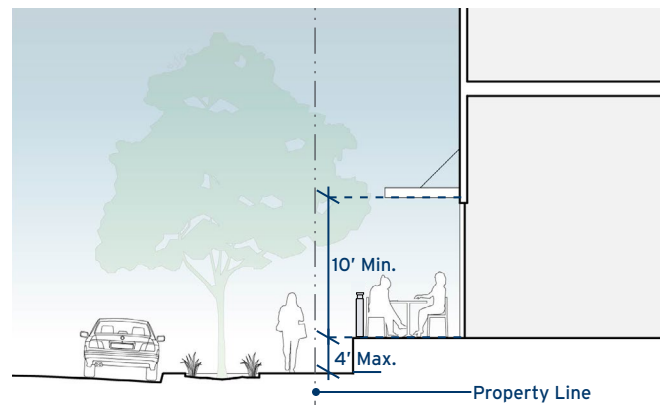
Raised Commercial Terrace Illustrative Section
